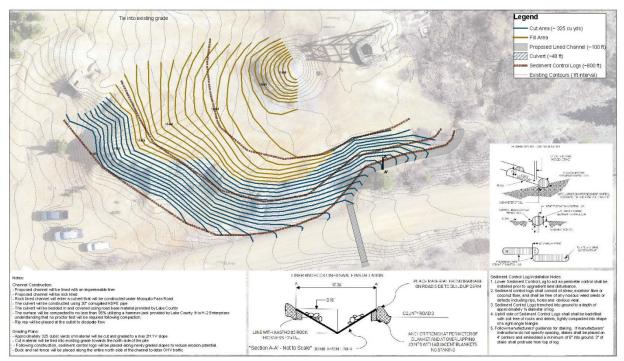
Silver Spoon 30% design detail showing re-graded slopes, wattle installation, channel path, and culvert location. Buck and rail fence is not shown, but is also included in plan.
